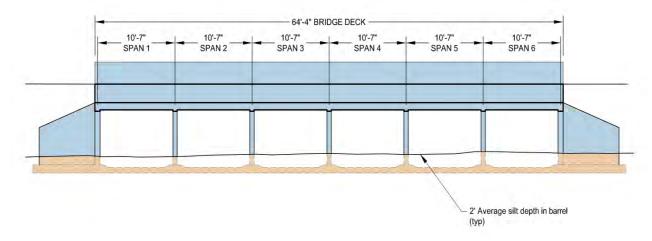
EI.24.11- 1: Elevation view of a multi-cell reinforced concrete culvert.
